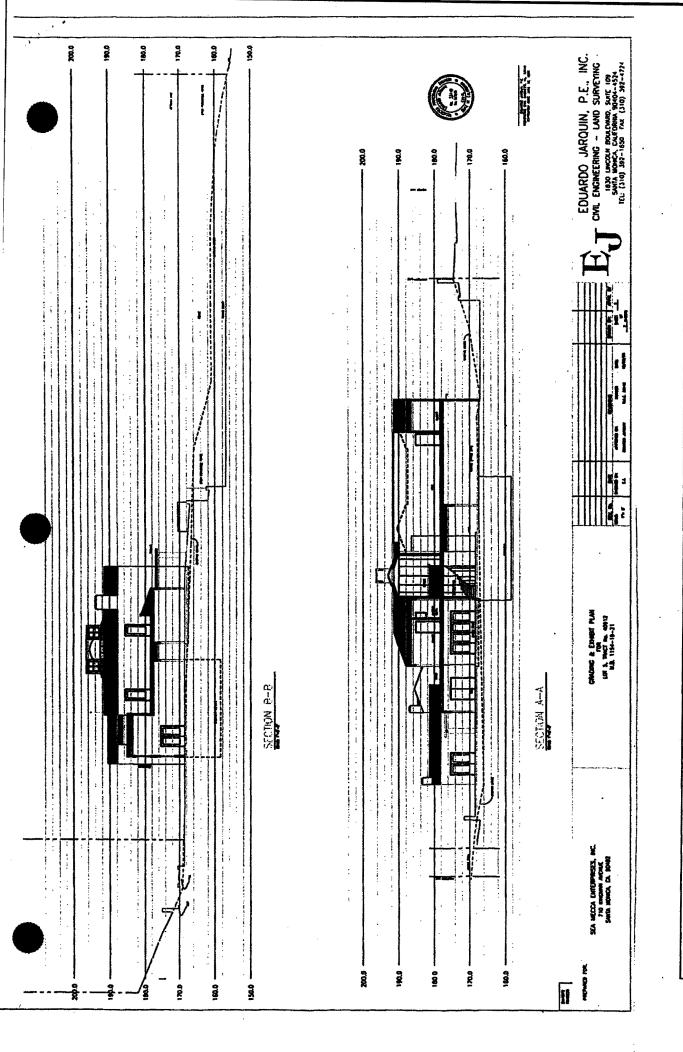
(4-96-196) Cross sections of Proposed Project
